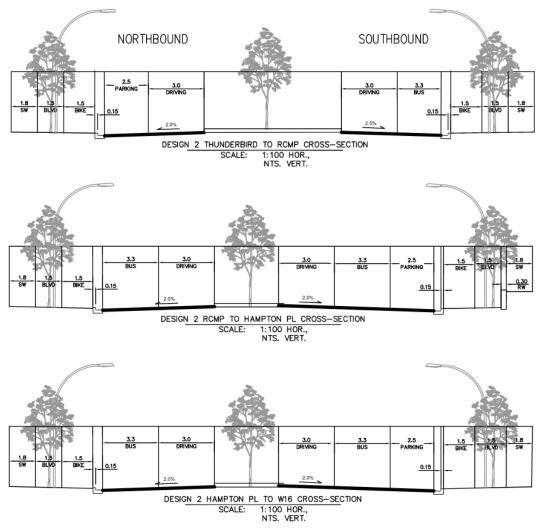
General Road Cross Sections (Northbound and Southbound)
